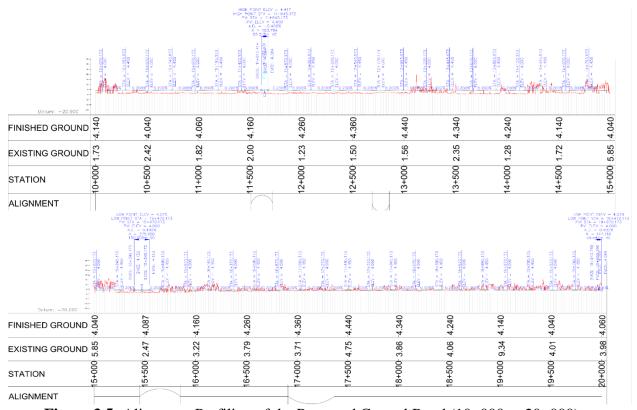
Alignment Profiling of the Proposed Coastal Road (10+000 to 20+000)
